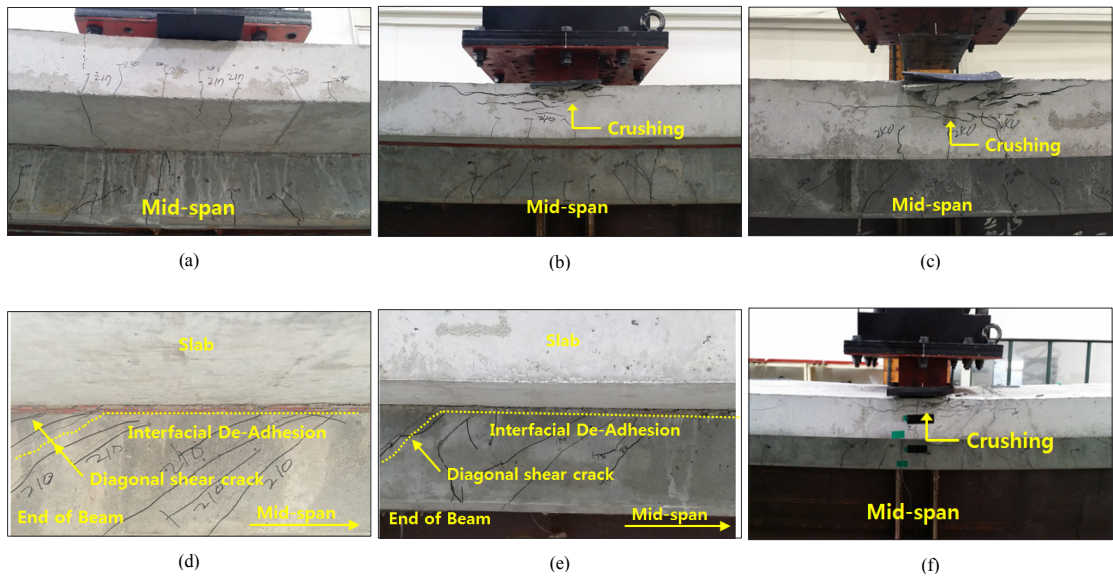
Failure Shape of Specimen Interface at Final Step (Casing to Slab)
